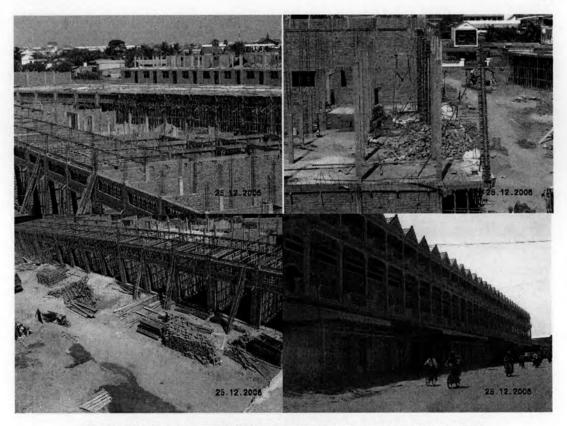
Commercial Building Construction Booming in Phnom Penh
